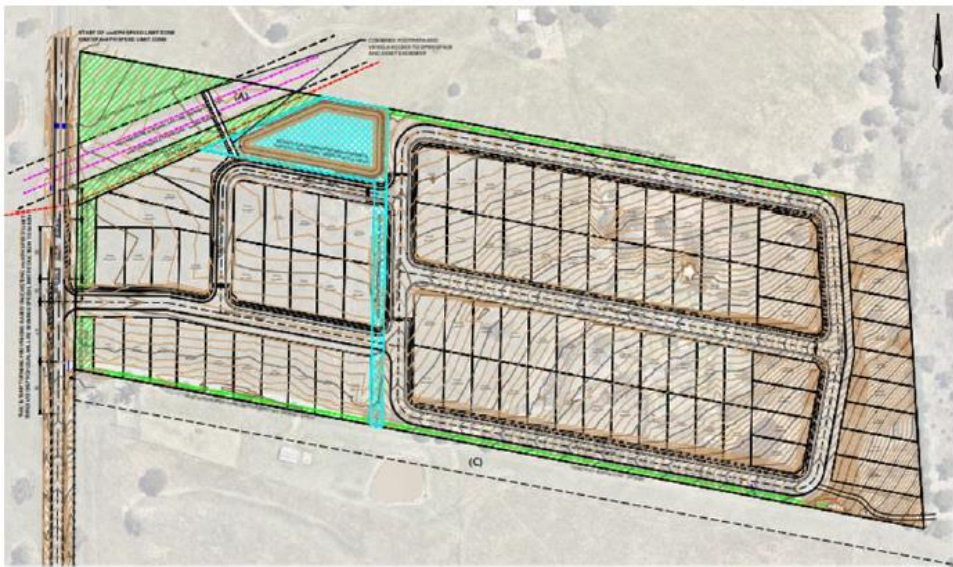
Proposed subdivision layout showing stormwater infrastructure
